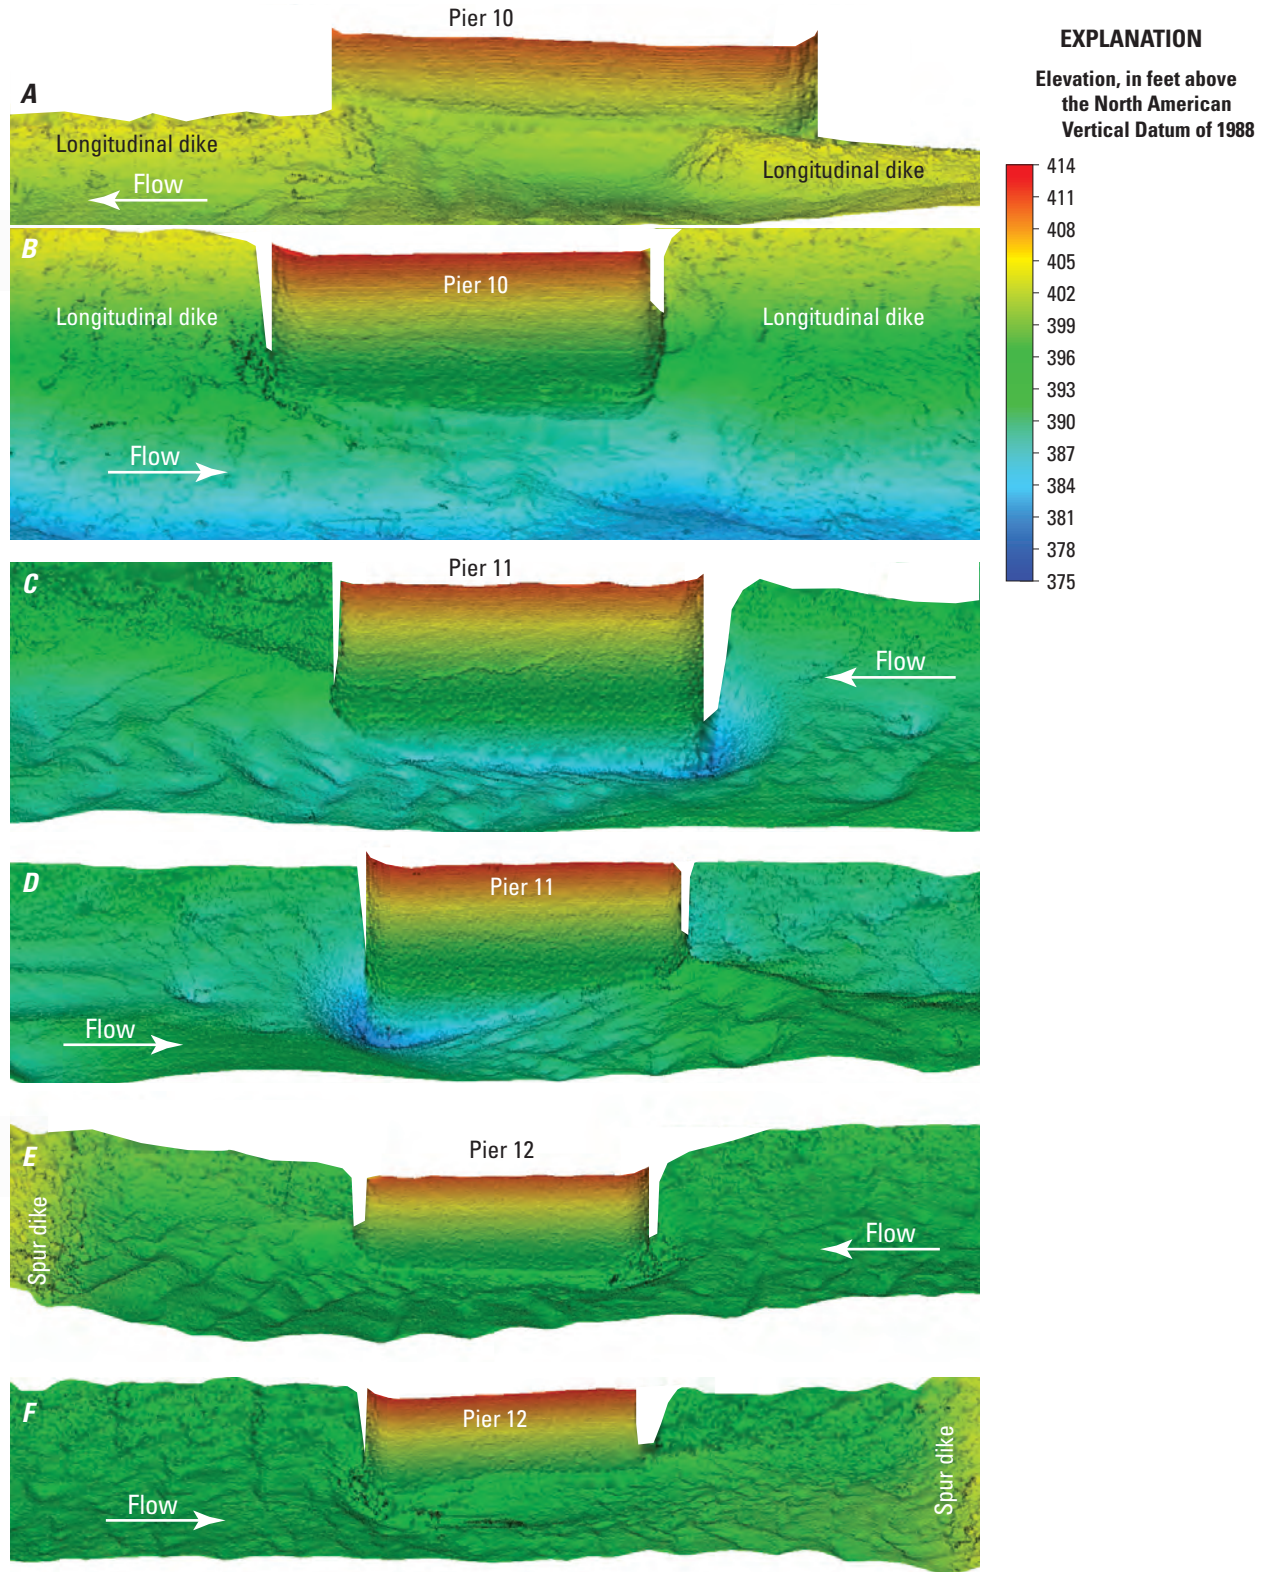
Shaded triangulated irregular network visualization of the channel bed and piers of structure A3047 on U.S. Highway 67 over the Missouri River near St. Louis, Missouri. *A*, left (north) side of pier 10. *B*, right (south) side of pier 10. *C*, left (north) side of pier 11. *D*, right (south) side of pier 11. *E*, left (north) side of pier 12. *F*, right (south) side of pier 12.
